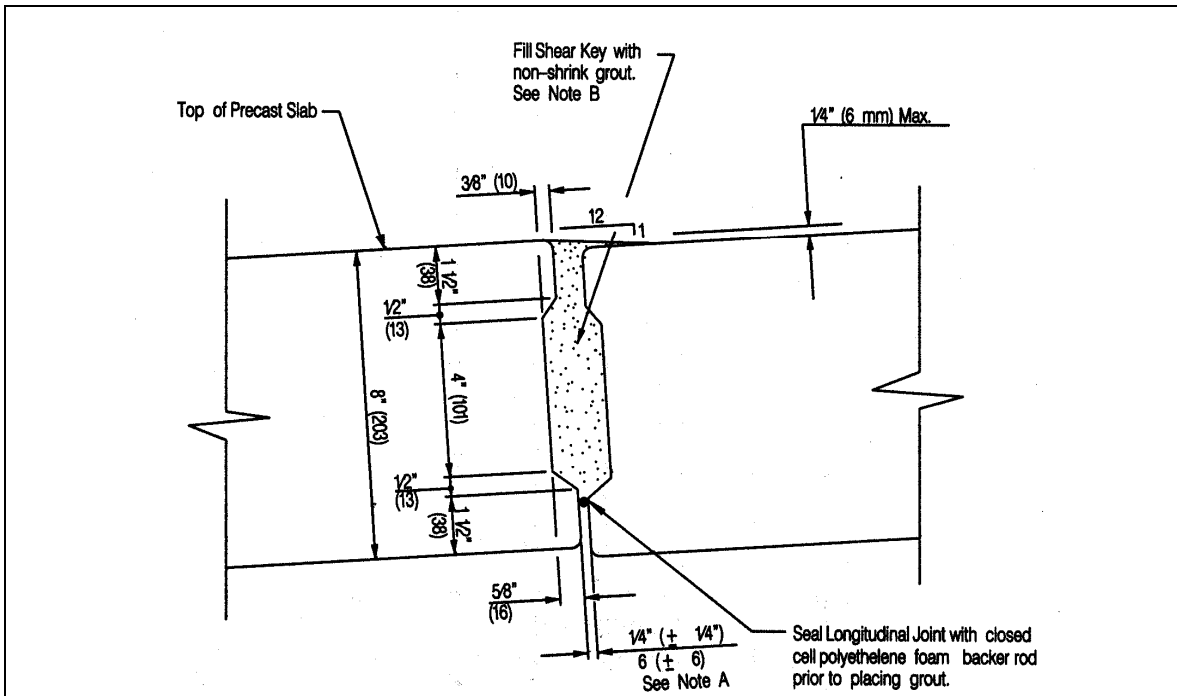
Typical transverse shear key section (PCINER, 2002)
